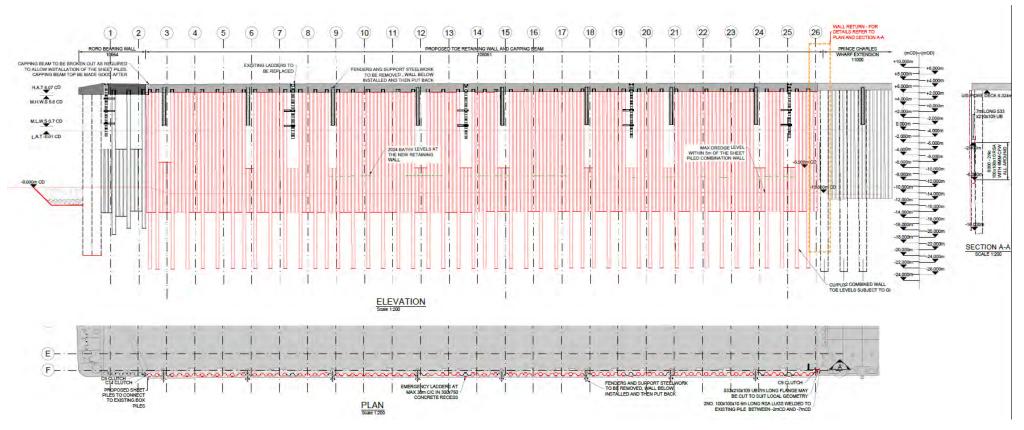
Improvement works to the PCW, elevation (top) and plan view (bottom) (Proposed Scheme are shown in red)
